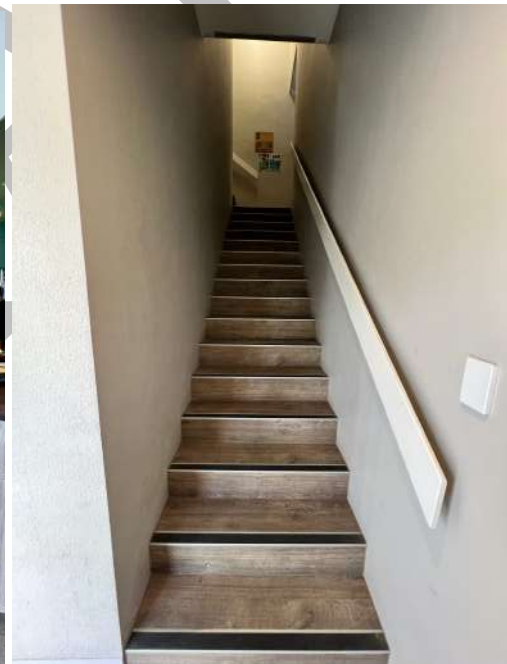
No.22-24 Raglan Street, Stair up to first floor.
